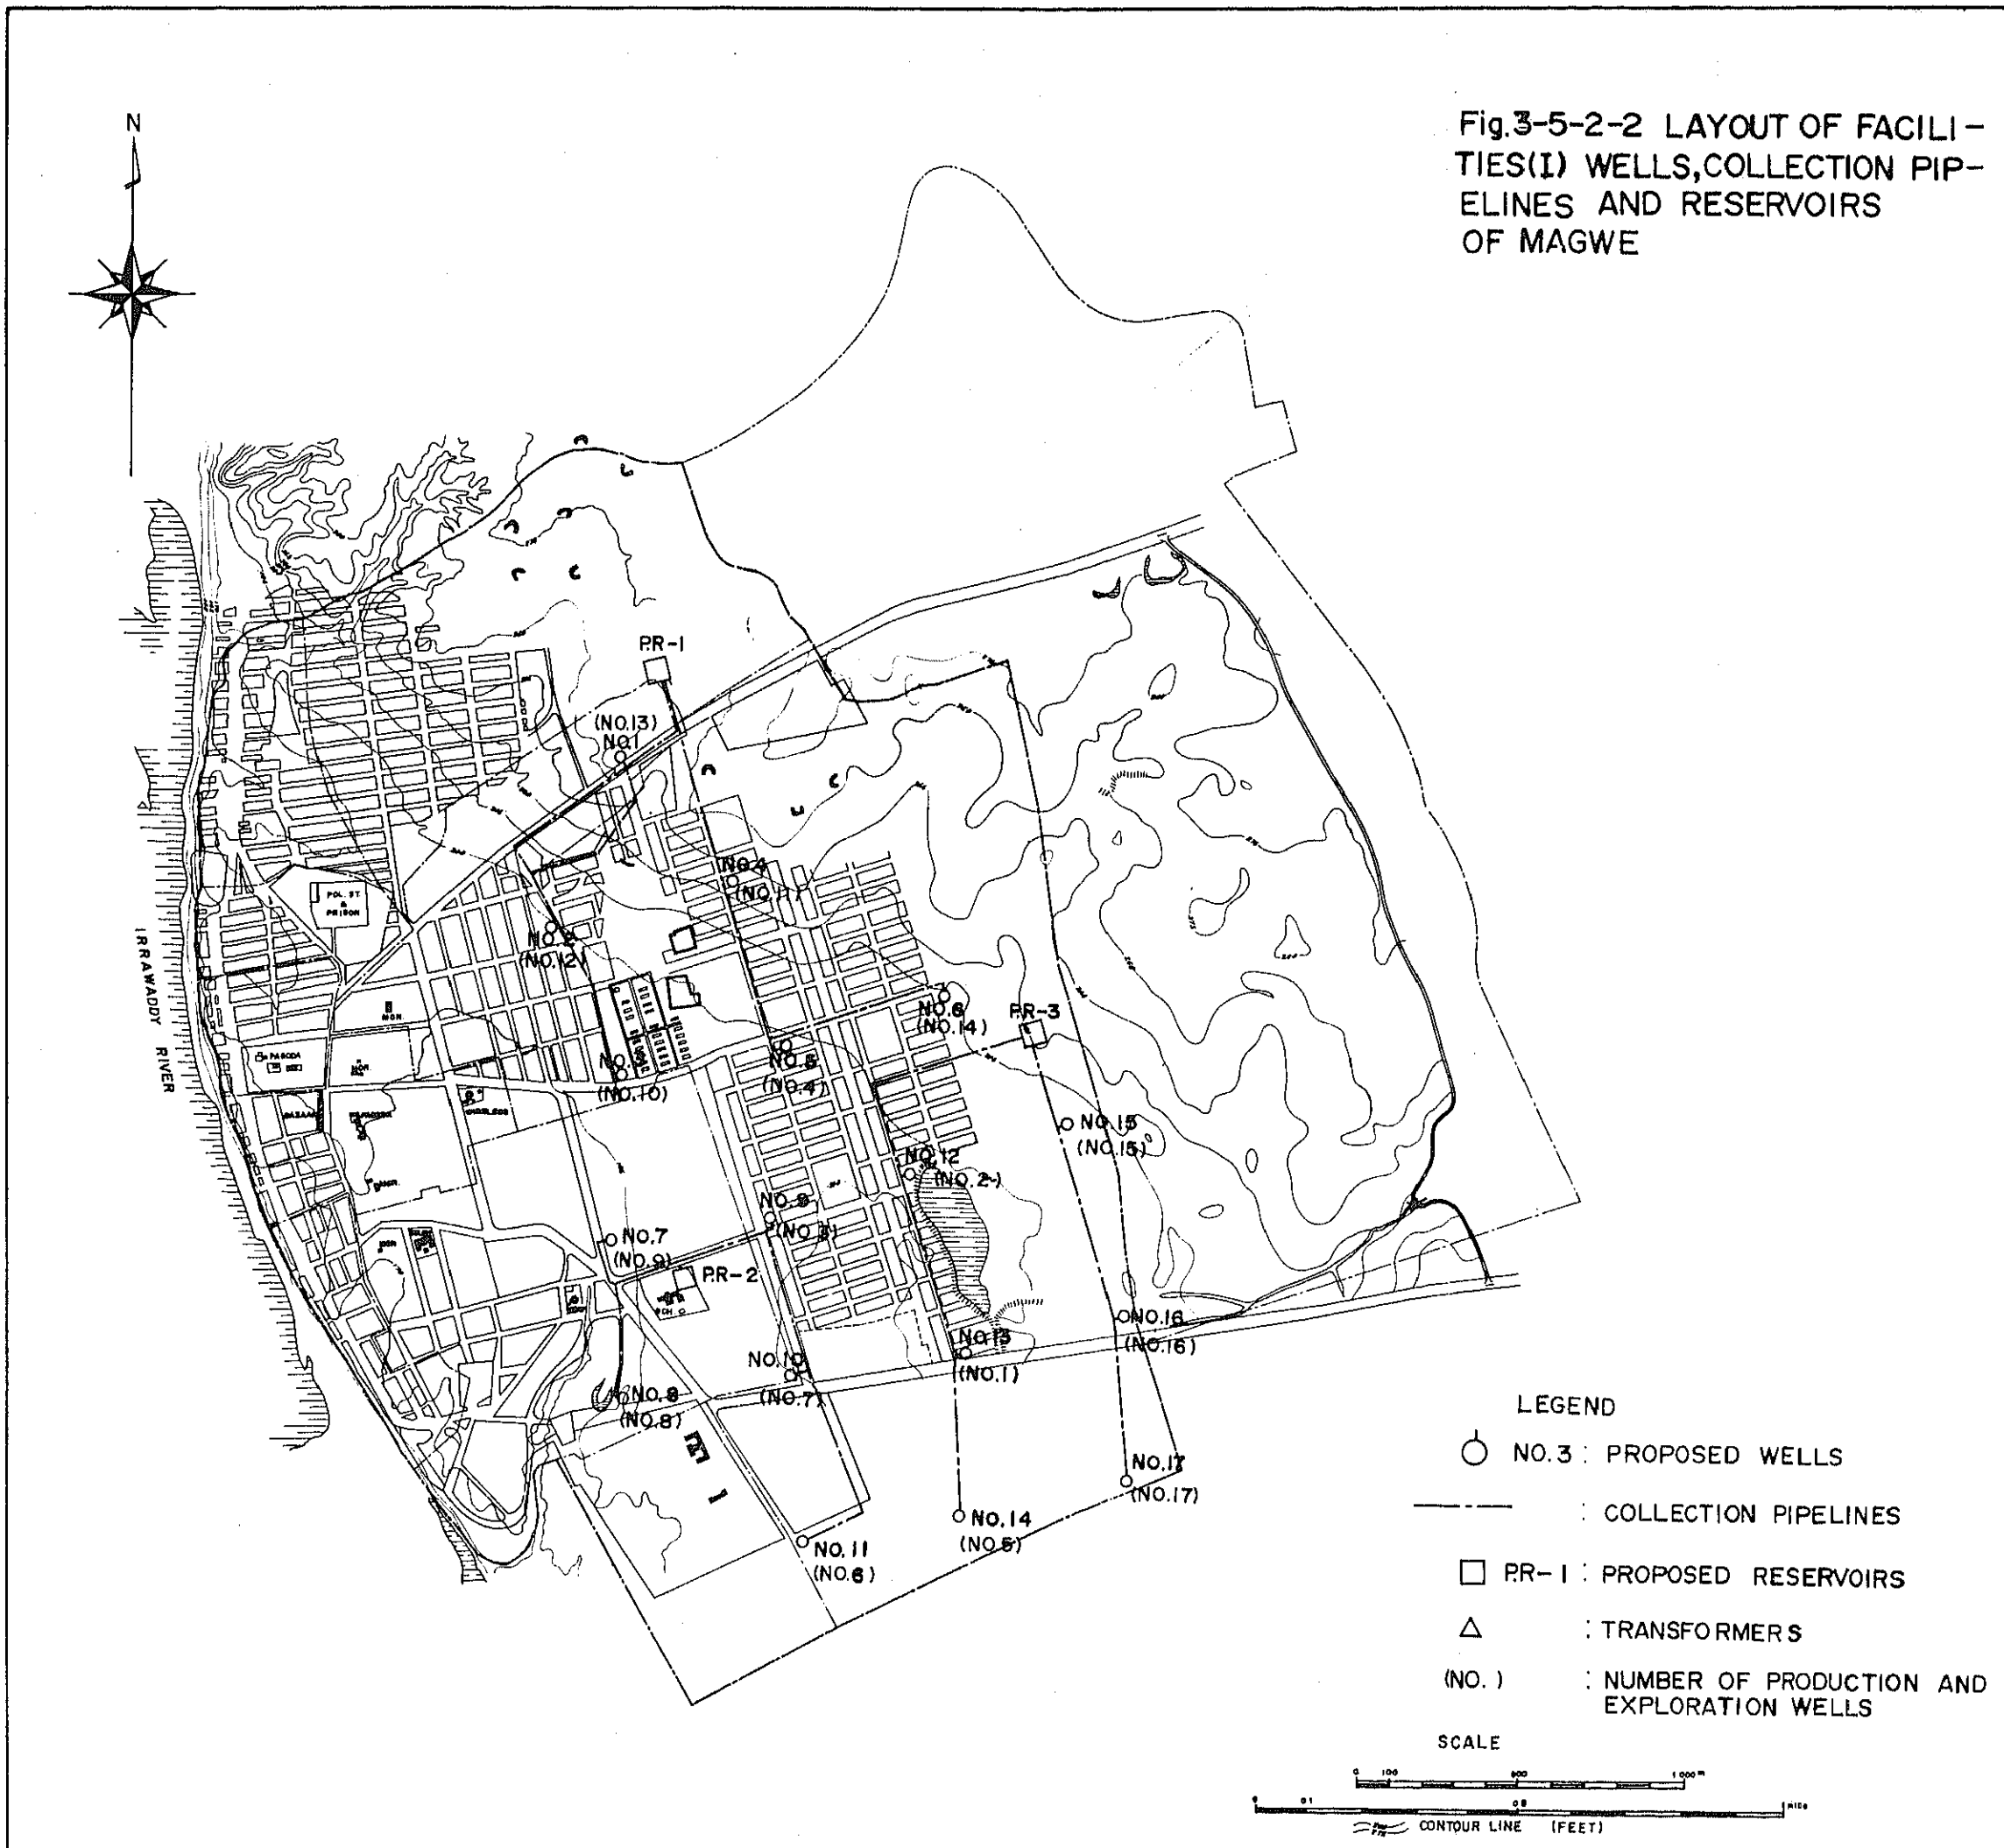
LAYOUT OF FACILITIES(I) WELLS, COLLECTION PIPELINES AND RESERVOIRS OF MAGWE
